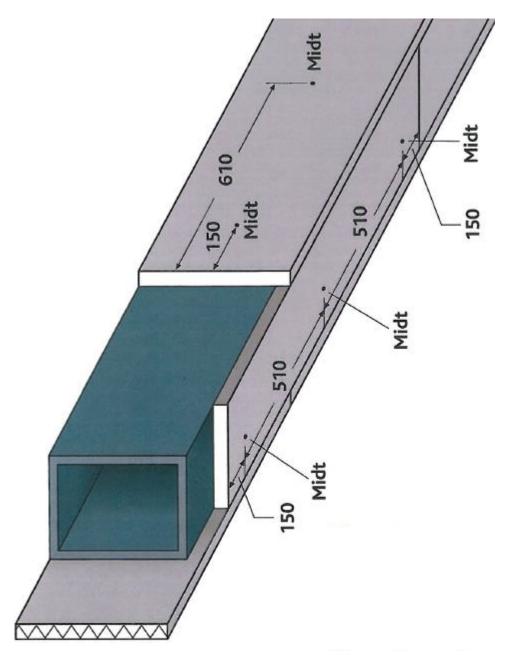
Position of shot nails in closed profiled steel – three sided Shot nails length 37 mm with Ø30 mm washer used for 25 mm fire protection Shot nails length 62 mm with Ø30 mm washer used for 50 mm fire protection Midt = centre
